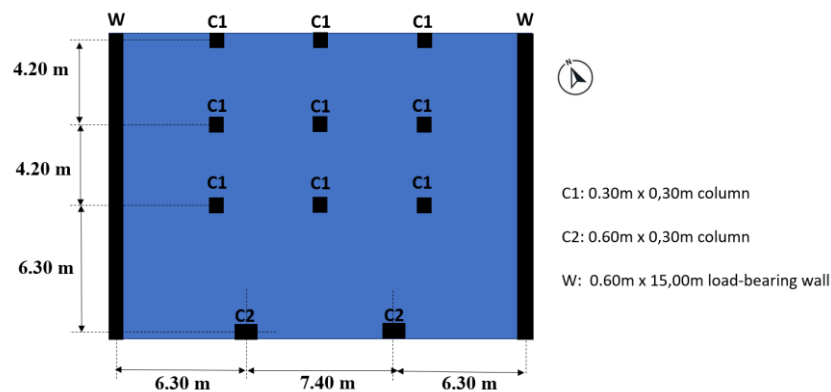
Drawing of the structural elements of the projected building: C1 and C2 stand for square and rectangular columns respectively, and W represents the load-bearing walls
